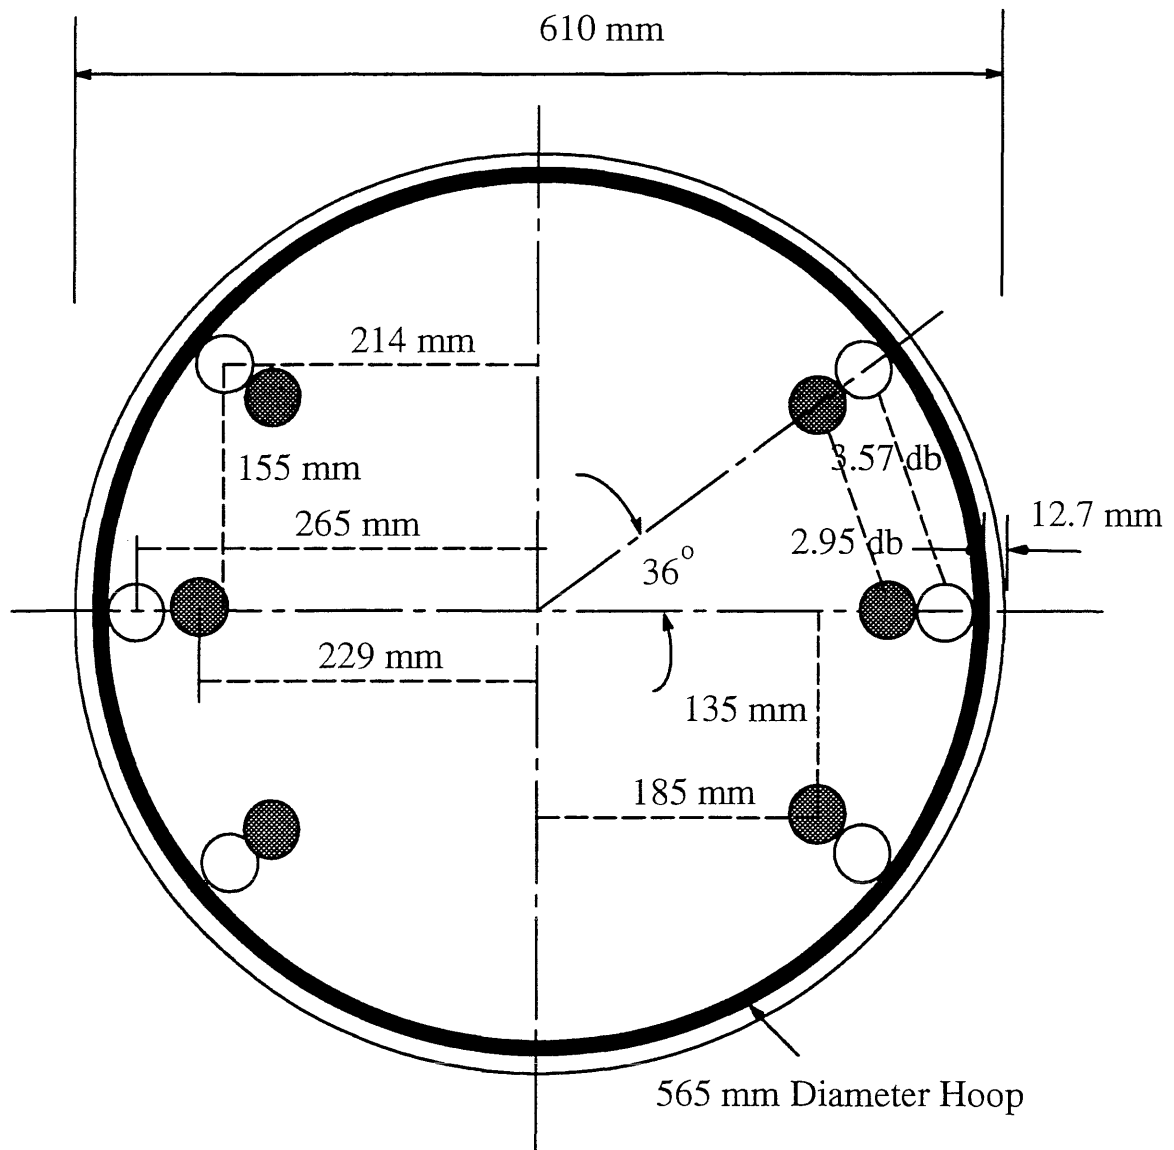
Cross Section for Column B-1 (L=0, C=12.7 mm)
